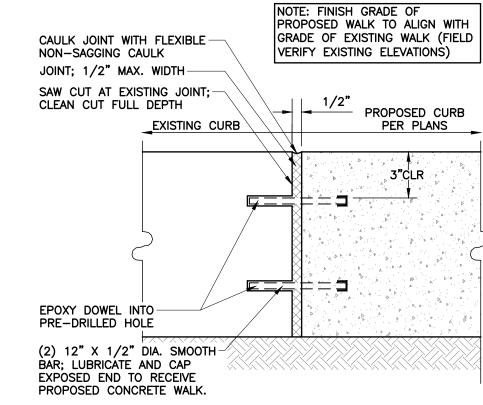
STRAIGHT CONCRETE CURB DETAIL
